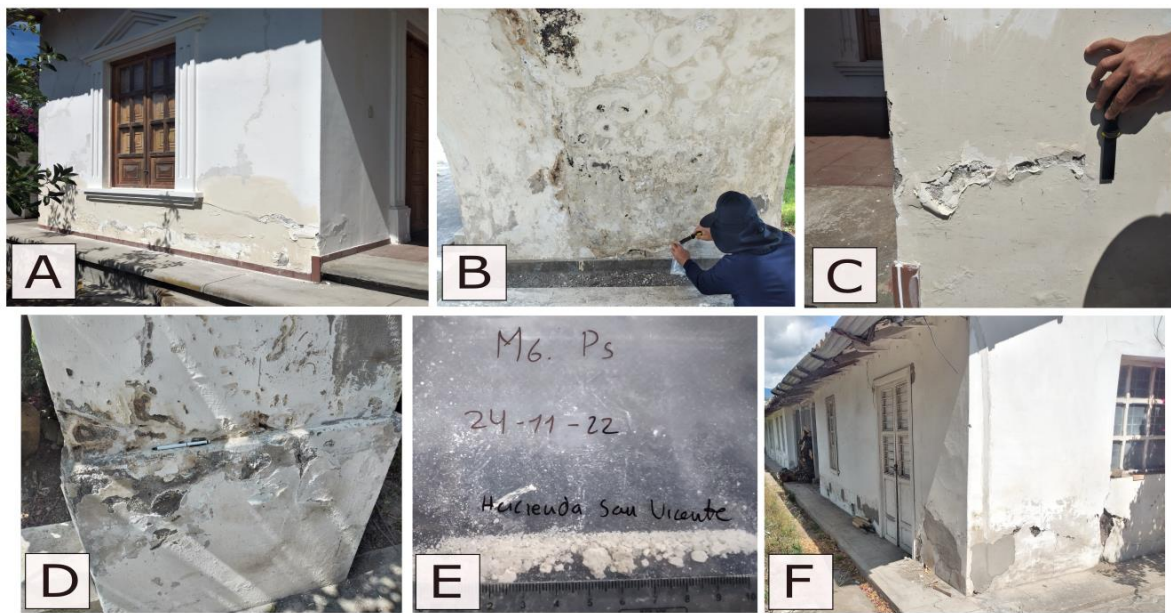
Deterioration in a San Vicente Farmhouse wall (See location on Figure 1) (A). Concrete bridge with superficial salt deterioration (B). The place where the sample was taken (C). Concrete wall with the presence of salt crystals (D). Salt sample M6P5 (E). House with fractures in the wall and fixed with cement mixture (F).
